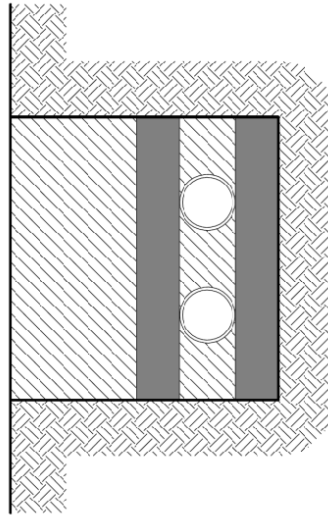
SECTION SHOWING TRENCH CONSTRUCTION
